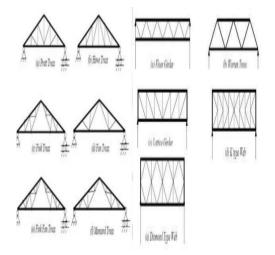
Pitched roof trusses Figure 1.2 Parallel chord trusses
